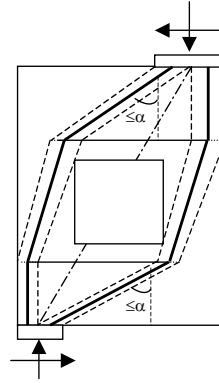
Model proposed by Roca for walls with opening. (source: Roca, 2004)
